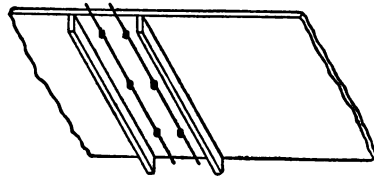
Conductors Protected by Wooden Guard-Strips on Low Ceiling.
